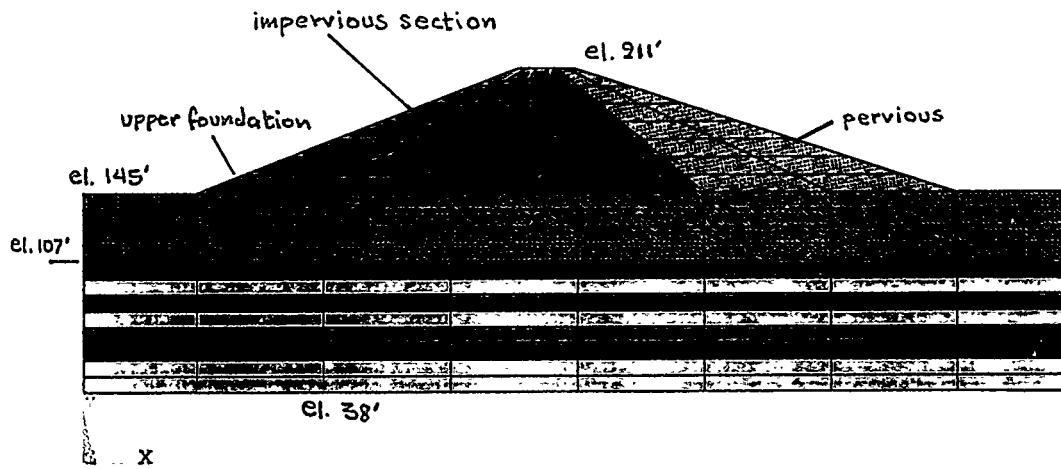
Cross Section of Par Pond Dam and Foundation
